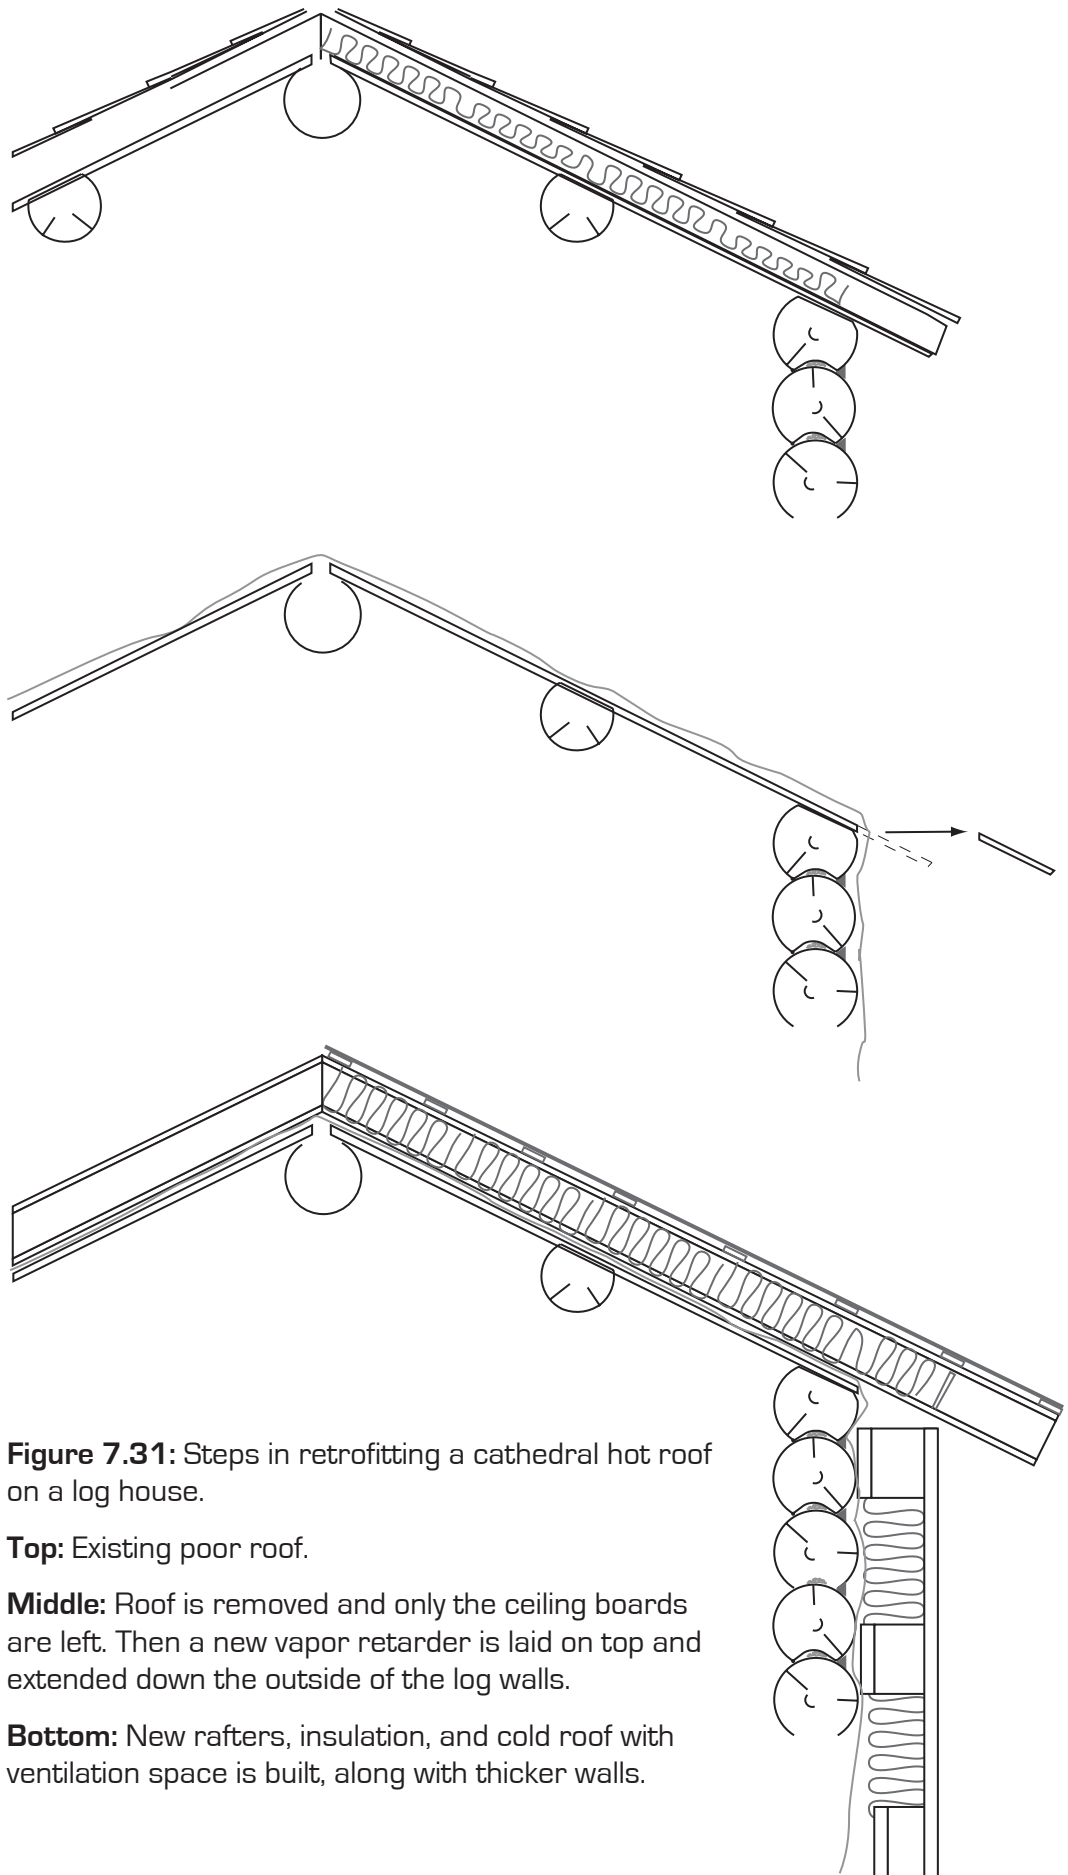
Steps in retrofitting a cathedral hot roof on a log house.
